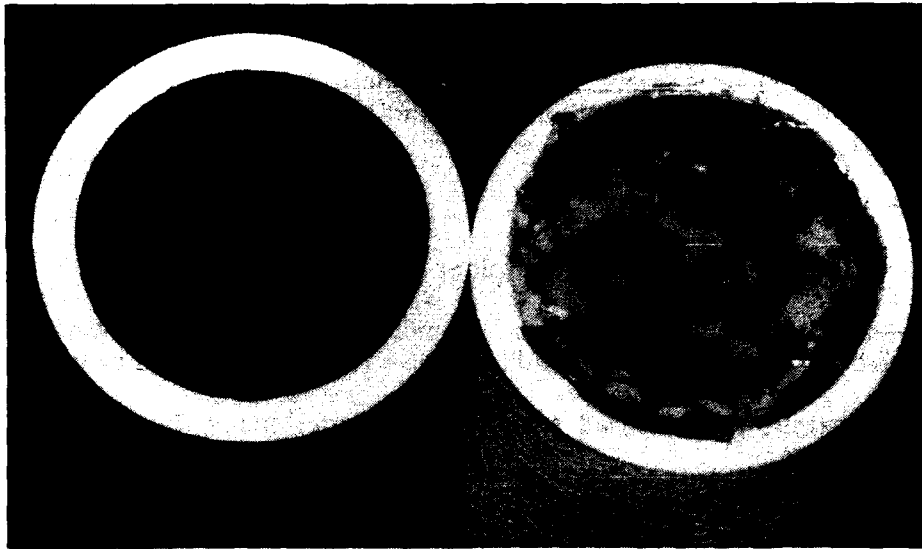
New pipe specimen and pipe specimen exposed to water in pipe loop system.
